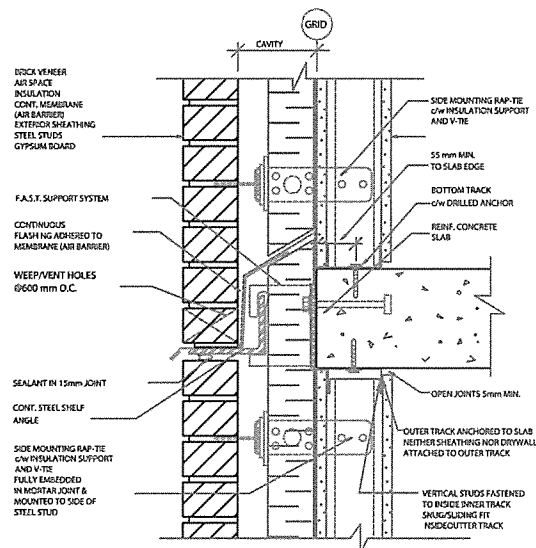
Brick Veneer / Concrete Block Detail at Slab Edge
